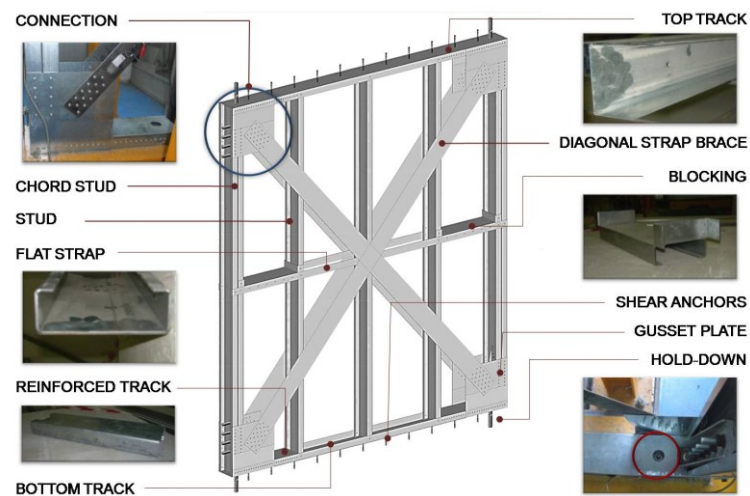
Typical configuration of a CFS diagonal strap braced wall.
